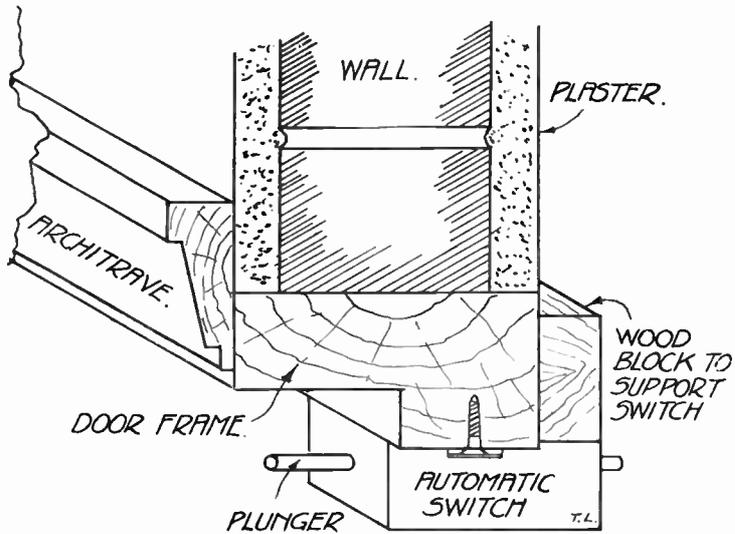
A.—FIXING AN AUTOMATIC DOOR SWITCH.
